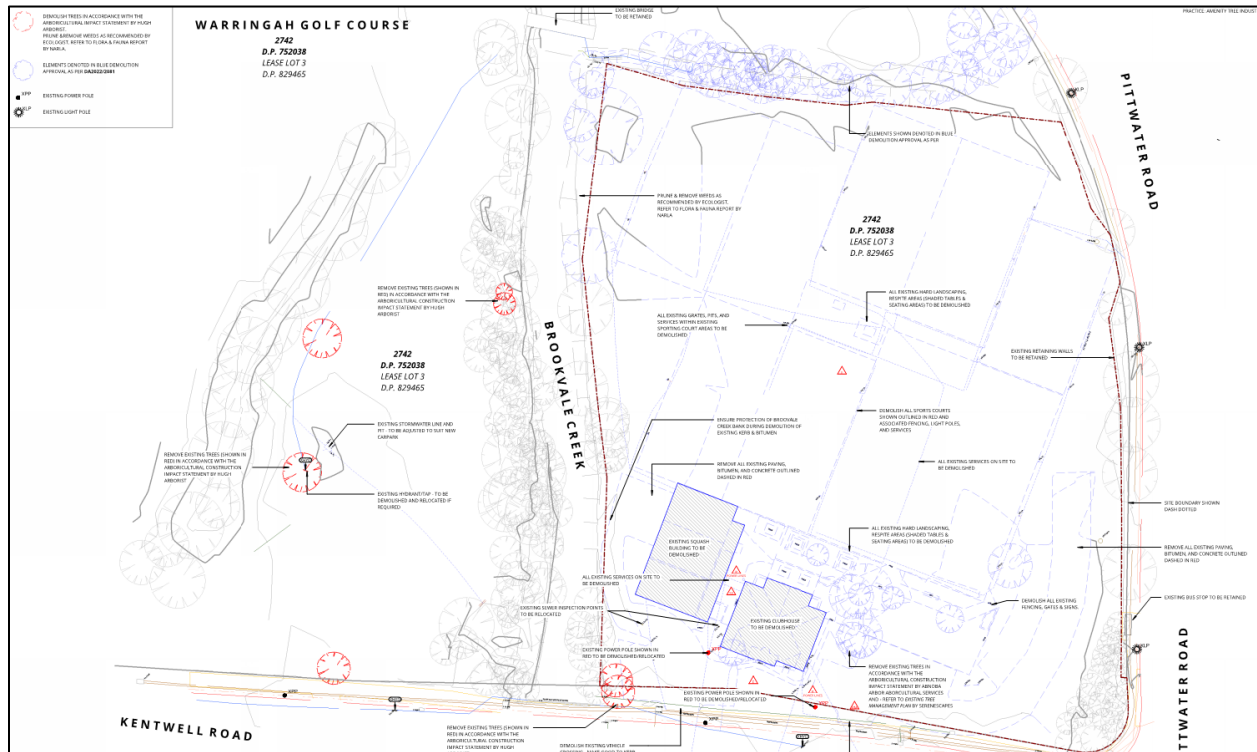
Demolition Plan (Source: Webber Architecture, 2024)
